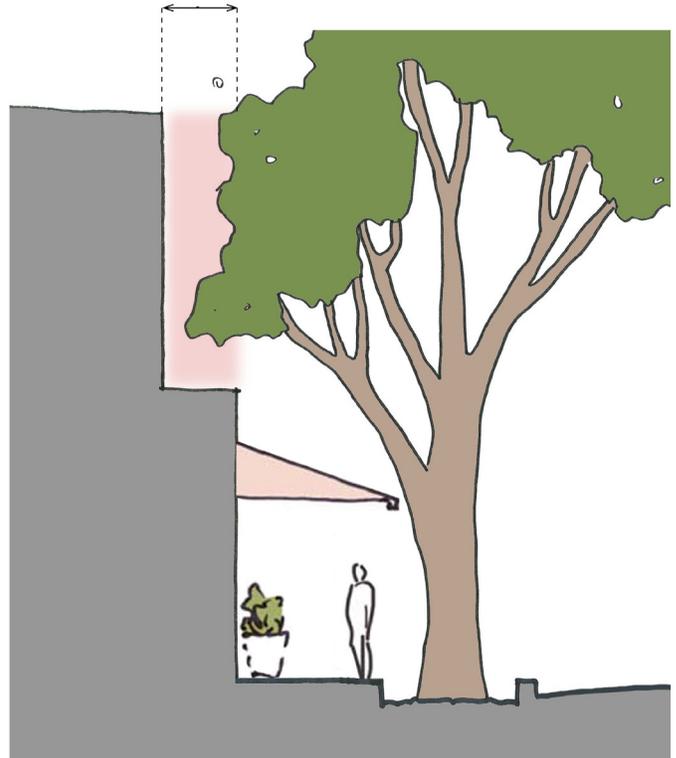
Use of a building step-back to allow space for canopy of large existing trees.
